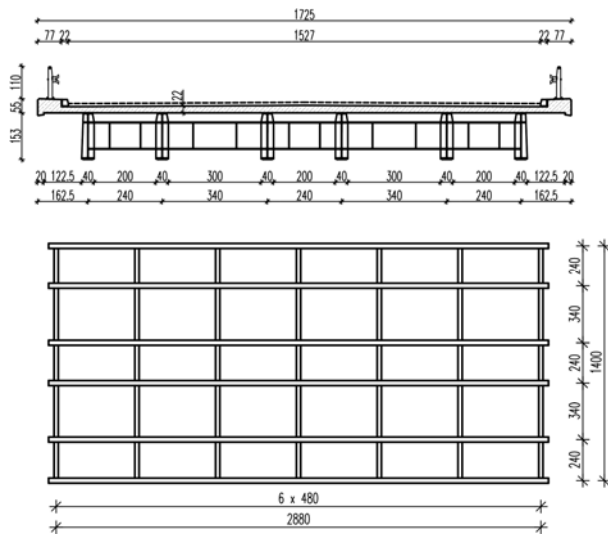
Cross section and plan view of the D(Mo)010 bridge
